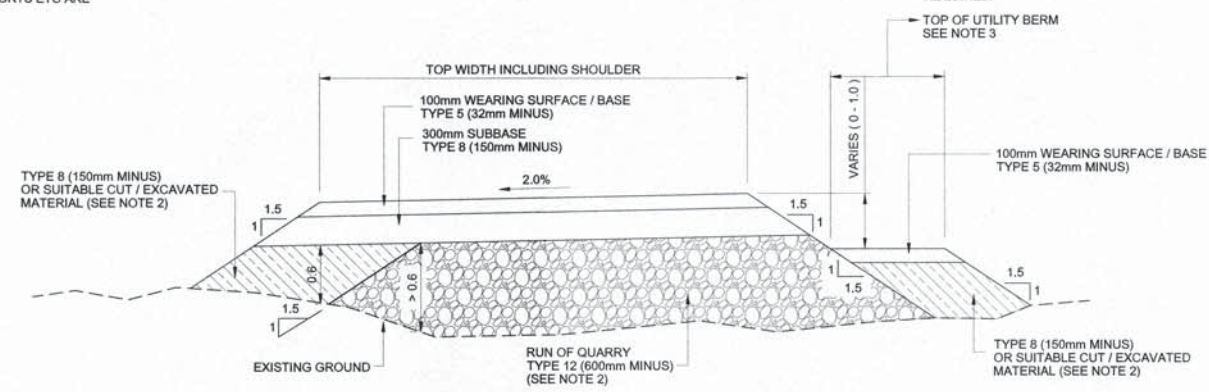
INTERNAL ROAD - REVERSE CROWN (WITH HIGHER UTILITY BERM)
